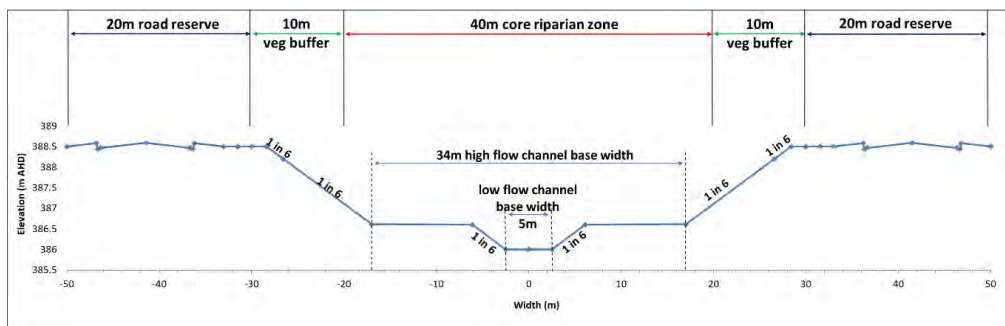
Conceptual arrangement of a typical cross section for a 60m wide waterway corridor
